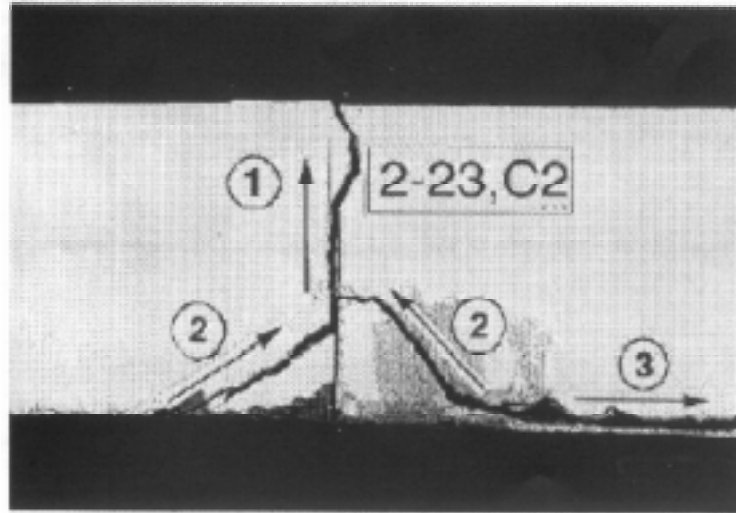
Typical failure mode including notch extension, 45-degree crack and interfacial delamination of center notched concrete specimen reinforced with carbonfiber sheet of two plies.
